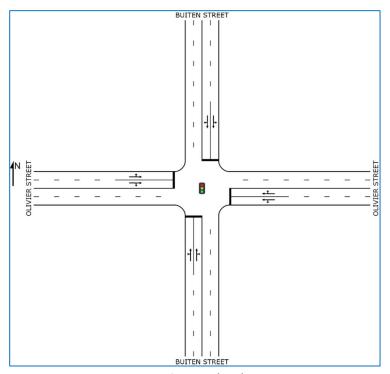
Proposed Layout of Olivier (R34) and Buiten Street – Intersection 4
